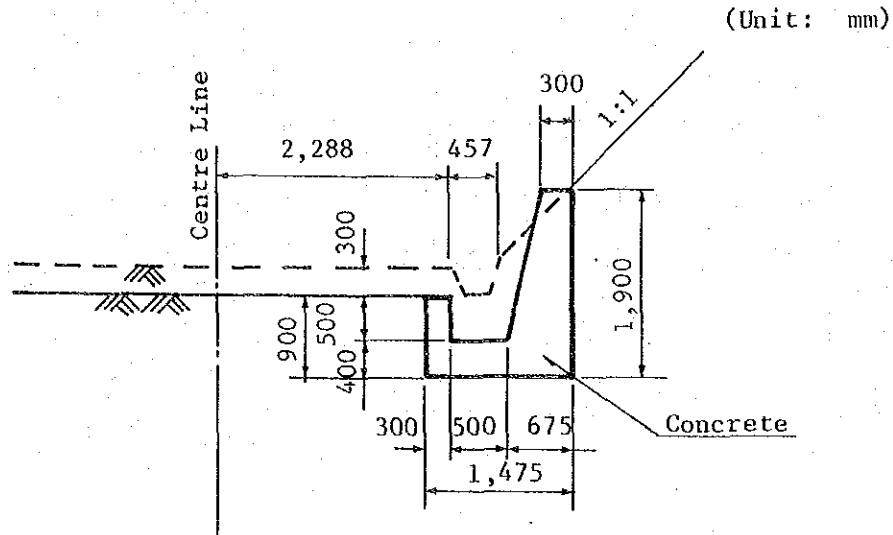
Rail Level Lowering (Standard Cross Section)
